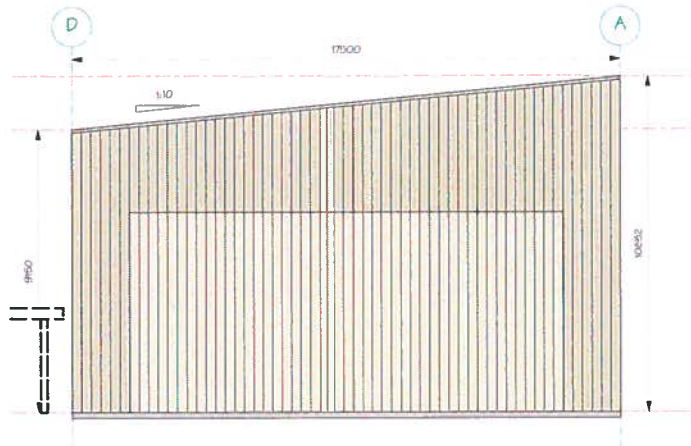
North Elevation (facing Sutcliffe Road) (from plans by Praxis Architects Inc.)
